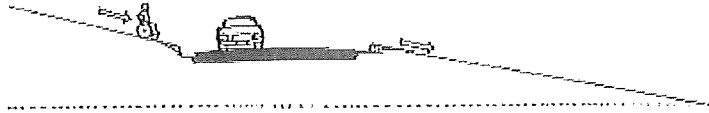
POTENTIAL PROBLEM: When the curb ramp section of the sidewalk corridor is not level, curb ramp grades are significantly increased and users cannot quickly move out of the street.
